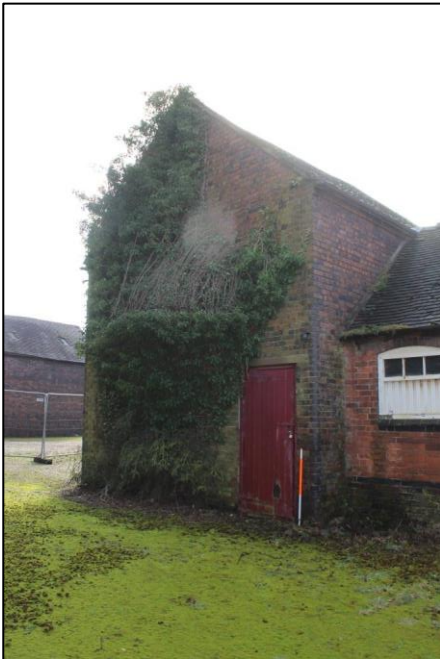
The northern gable of Building 3 and the eastern extent of the northern elevation of Building 4.
